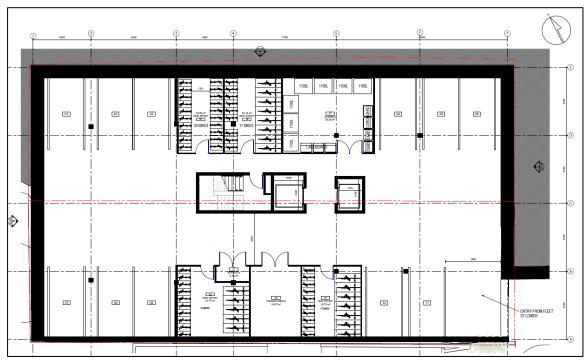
Proposed Site Plan Image Source: PB&A Architects
